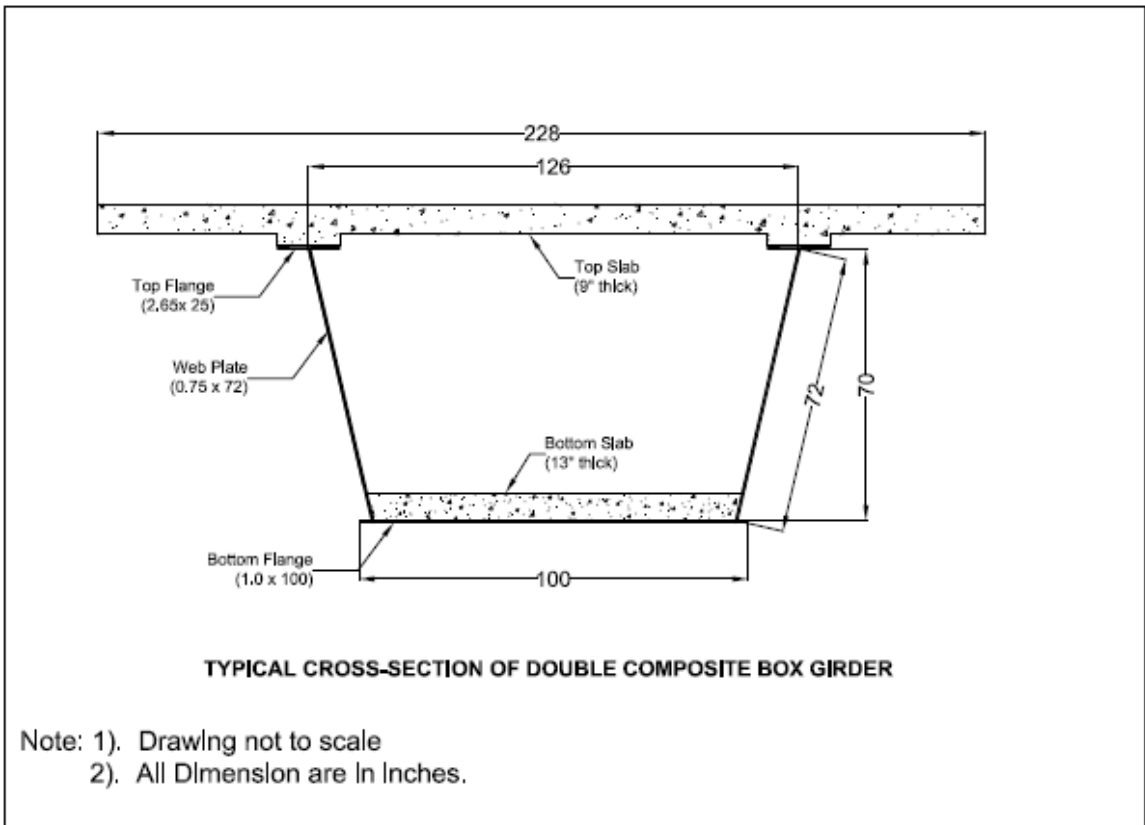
Typical Cross-Section of Double Composite Box Girder
